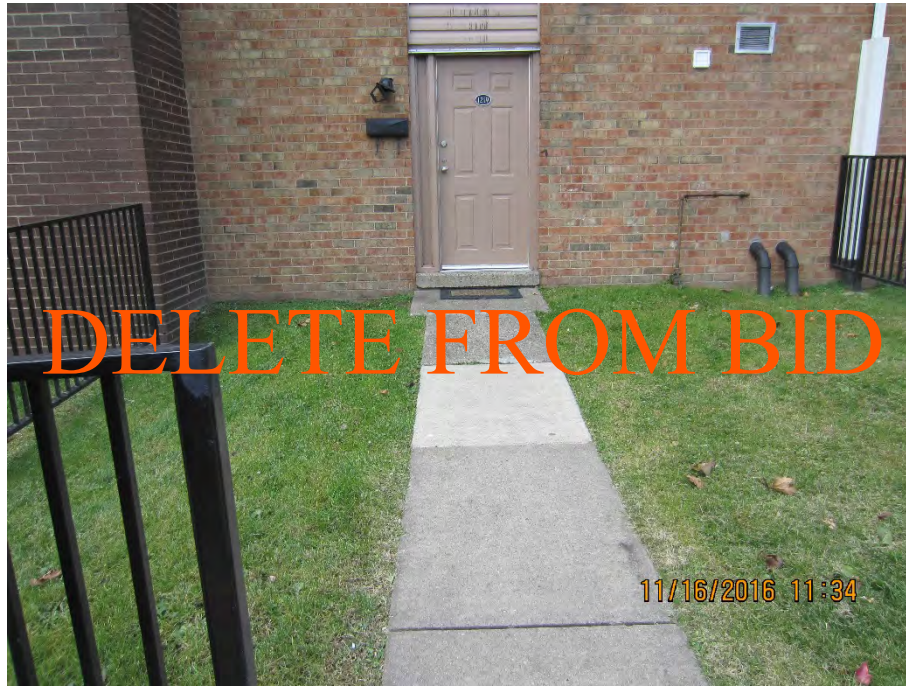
Foam lift slab, neoprene seal and caulk [Plan Sheet SP-1]
